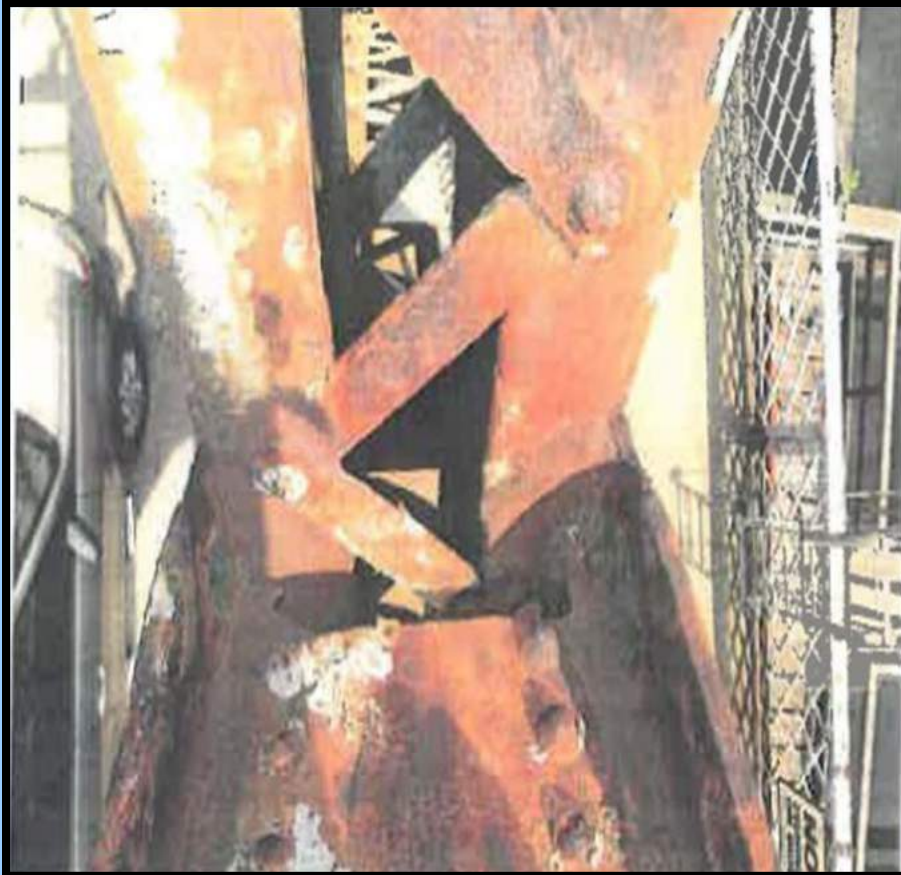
South truss connection, material loss to member angles connection plates, and lacing bars
